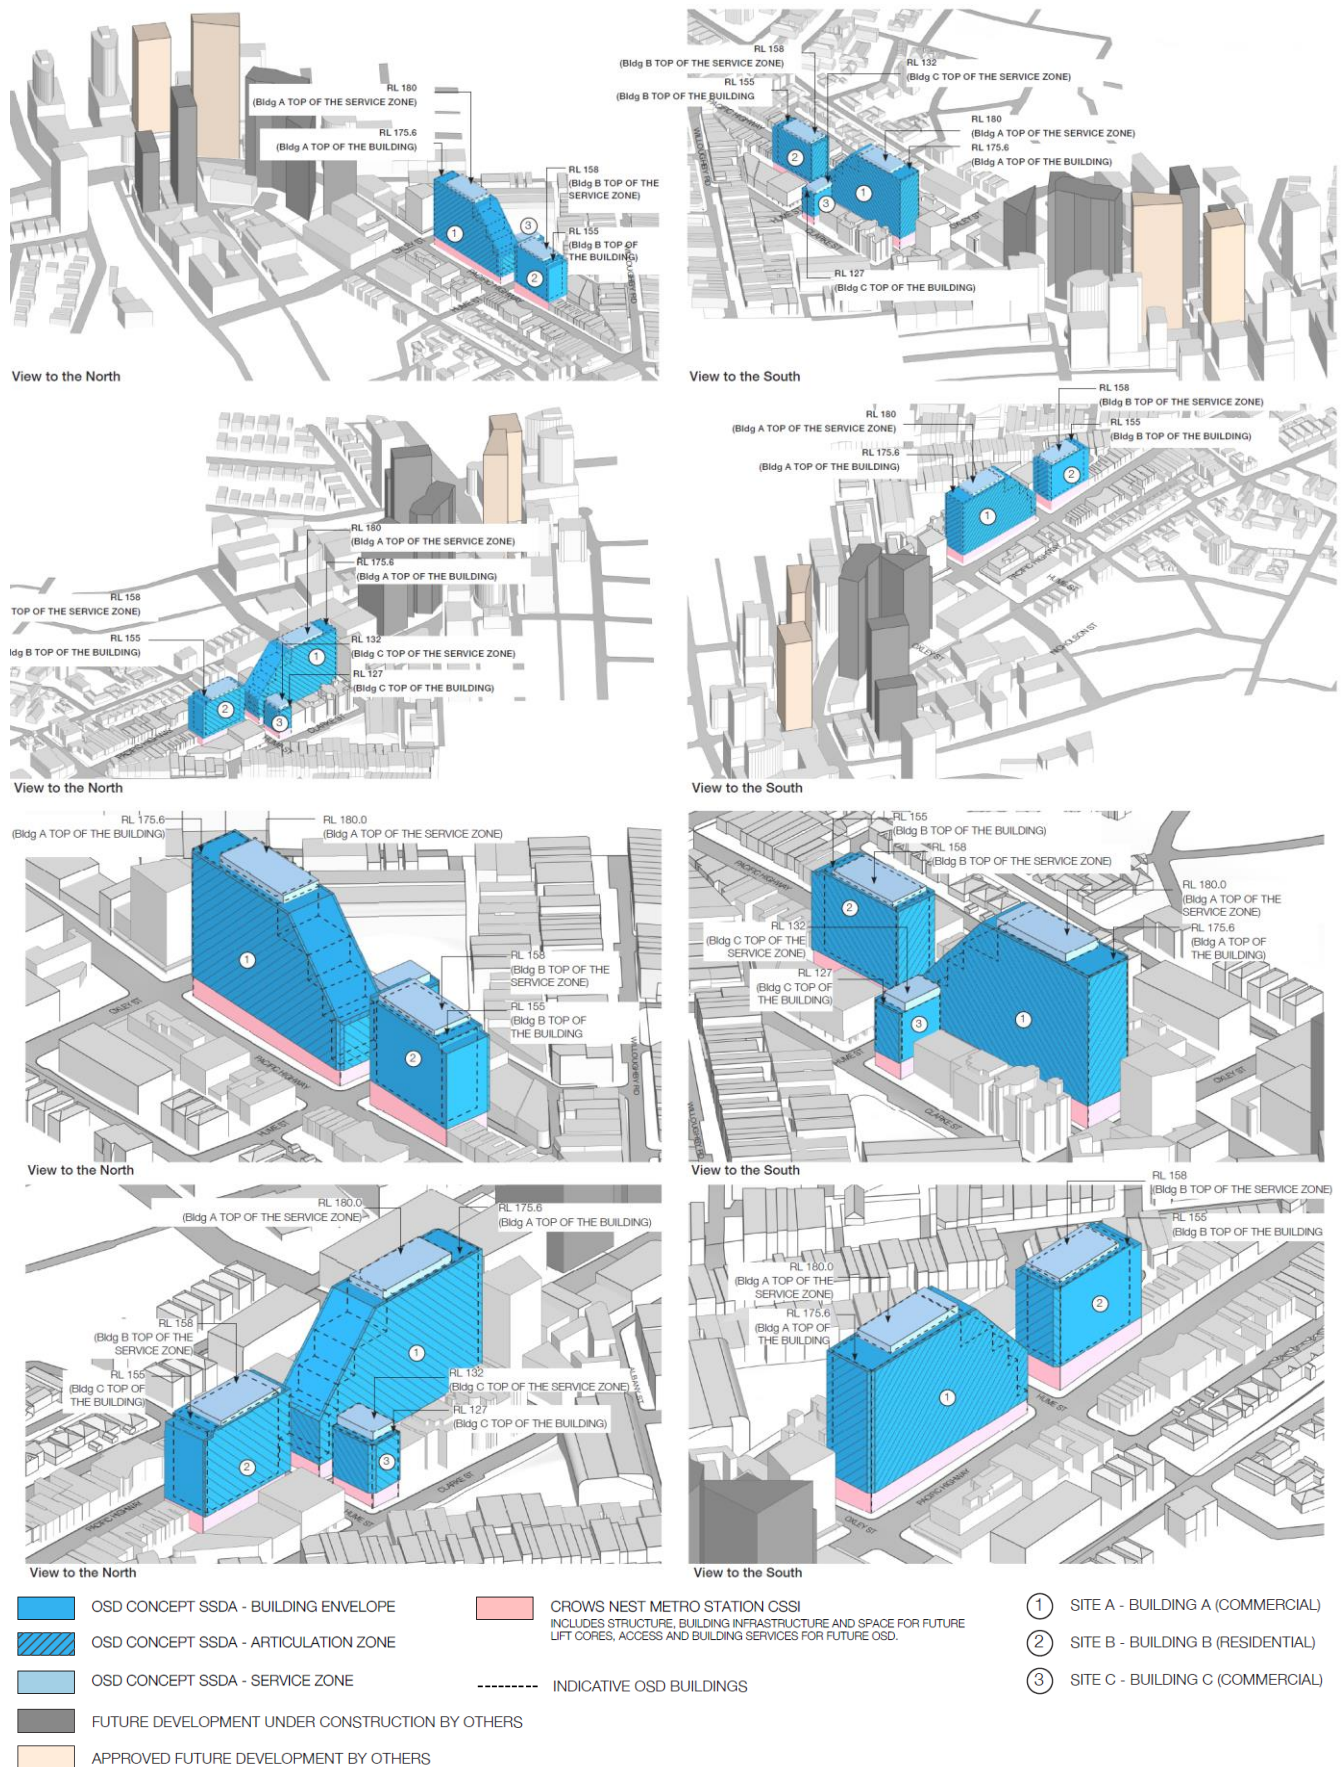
The amended scheme envelope shown in emerging context (above) and in detail (below)
